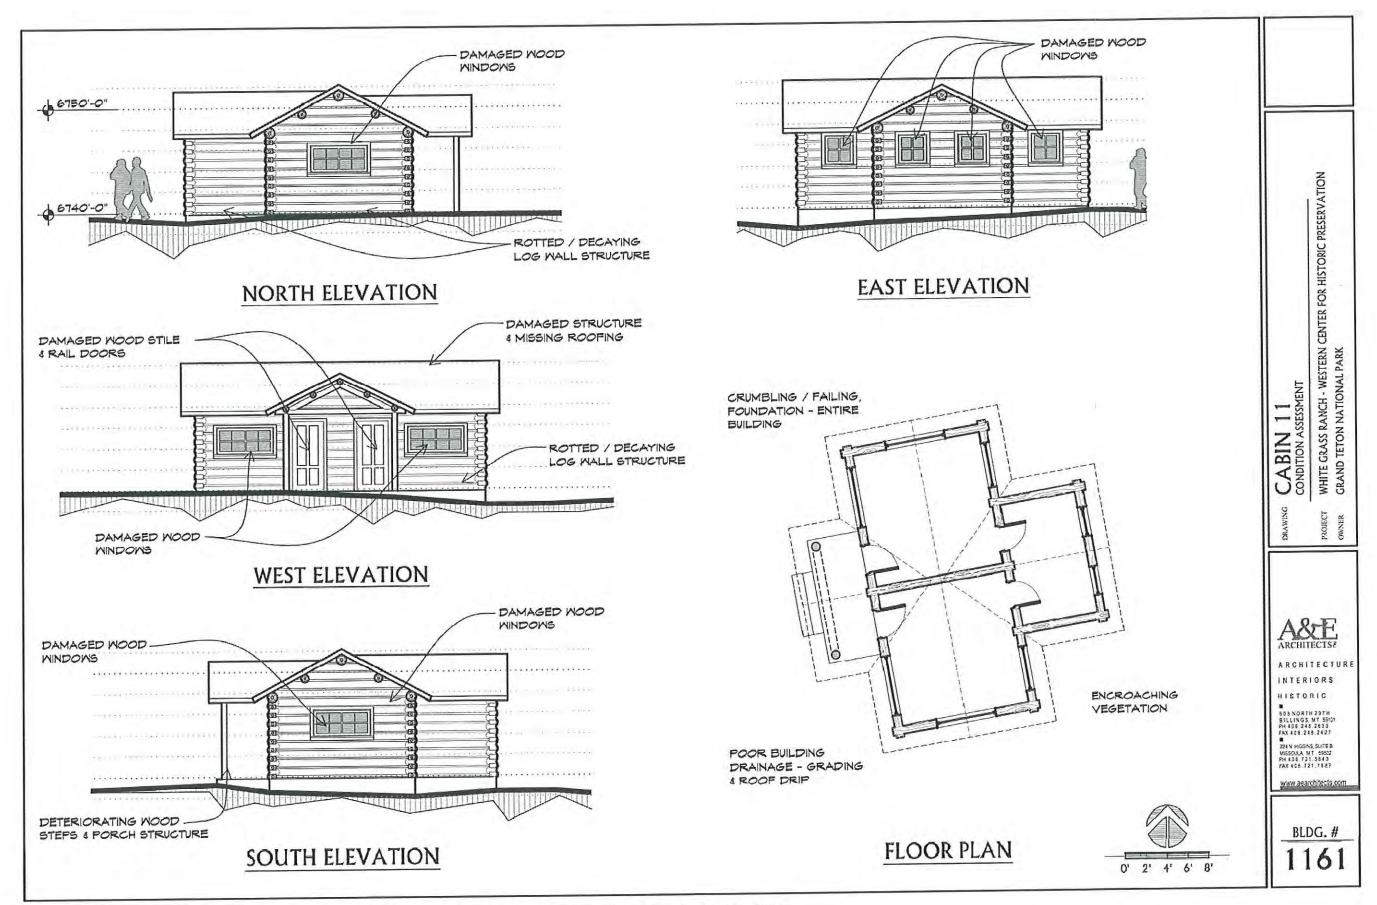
Existing conditions plan and elevations for HS-1161, Cabin 11, showing areas of deterioration (A&E: 2006).
